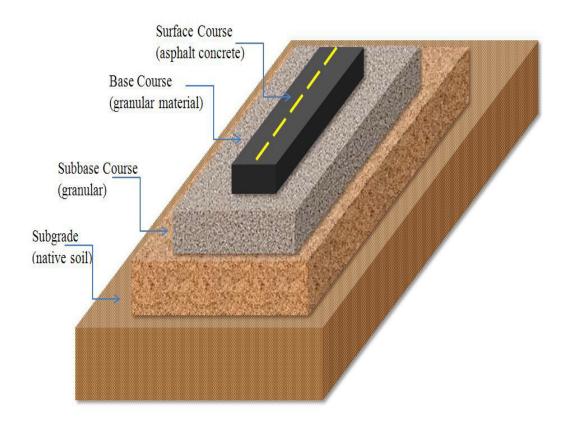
Typical cross section of an asphalt pavement (fhwa.dot.gov)
